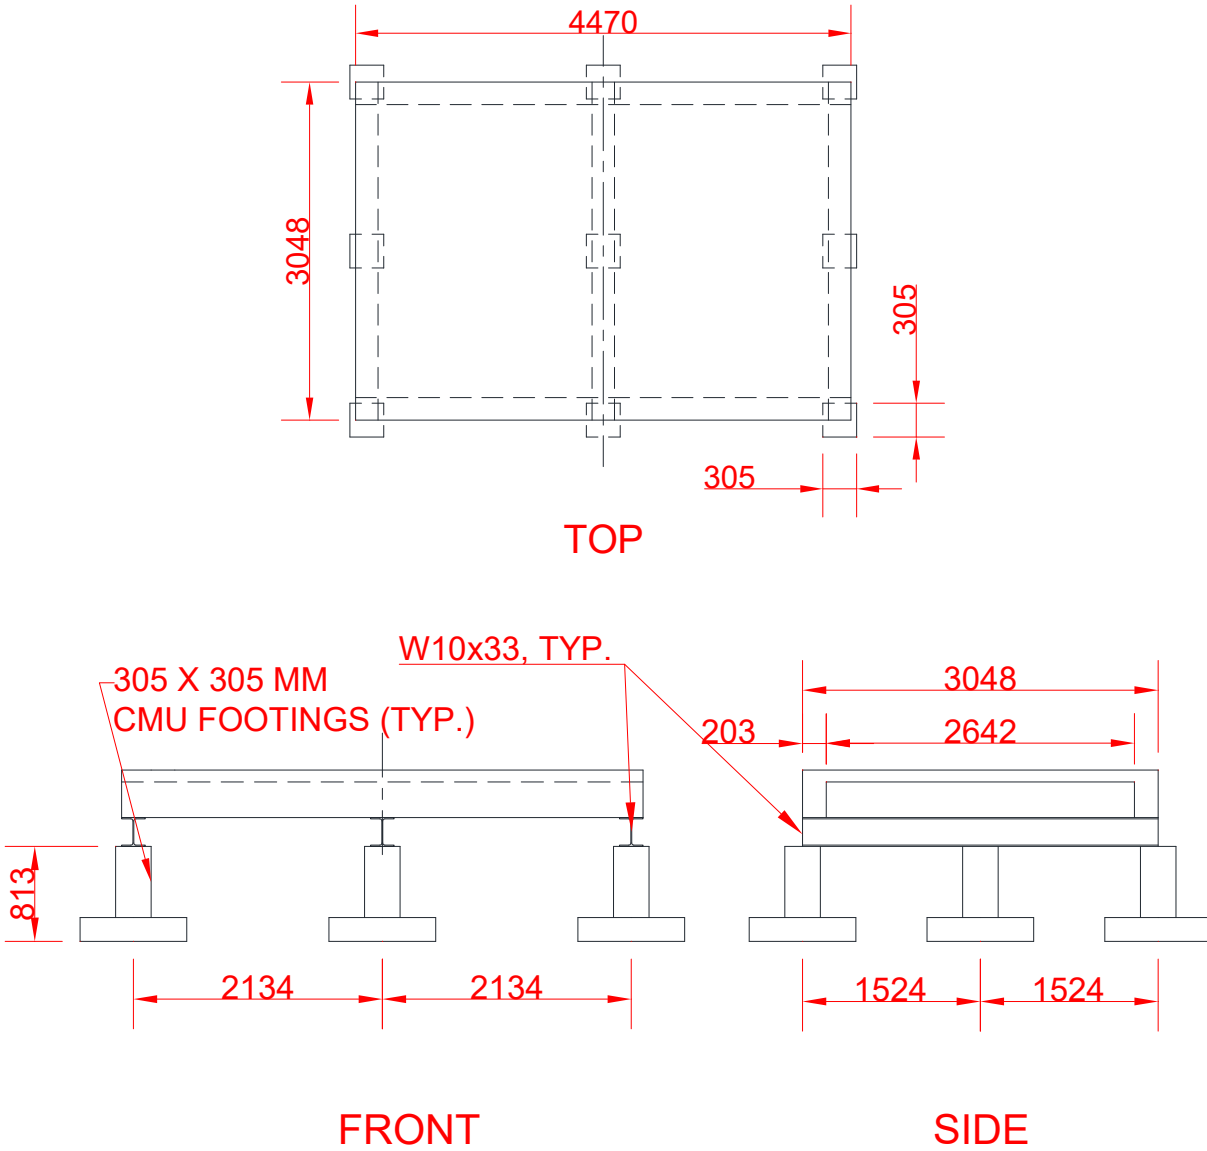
Four-Panel Slab Specimen (All dimensions in mm)
